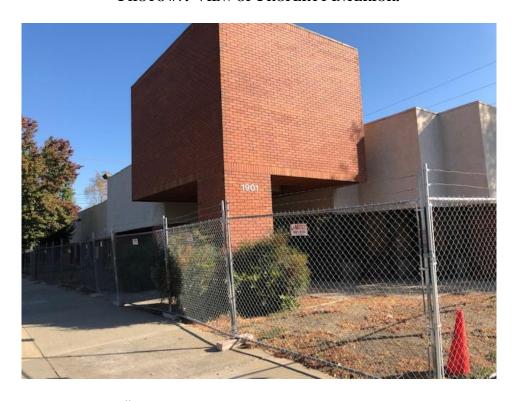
VIEW OF SOUTHWEST CORNER OF PROPERTY.
